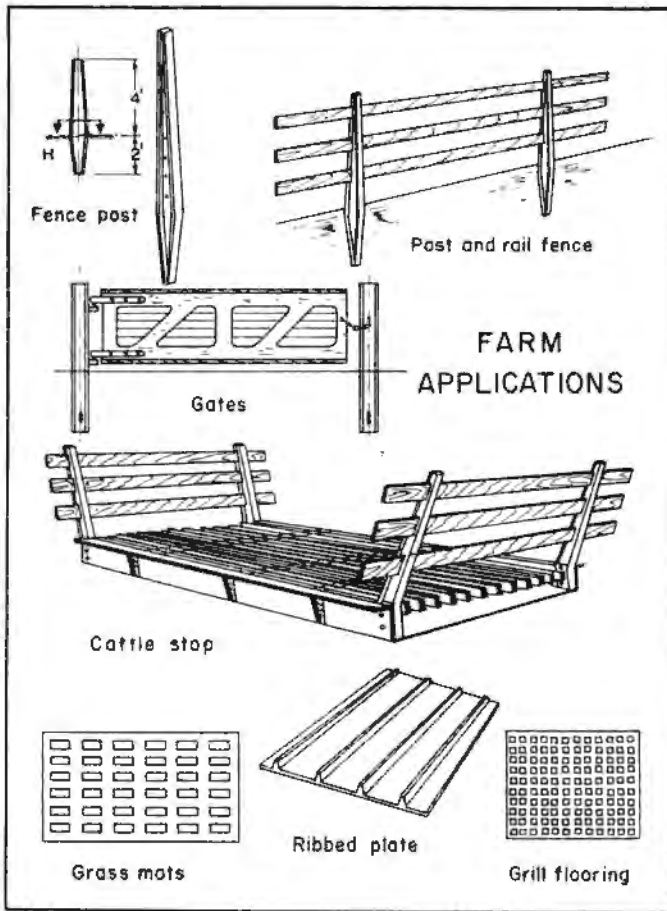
Some typical applications of fibrous ferrocement for farm structures.
